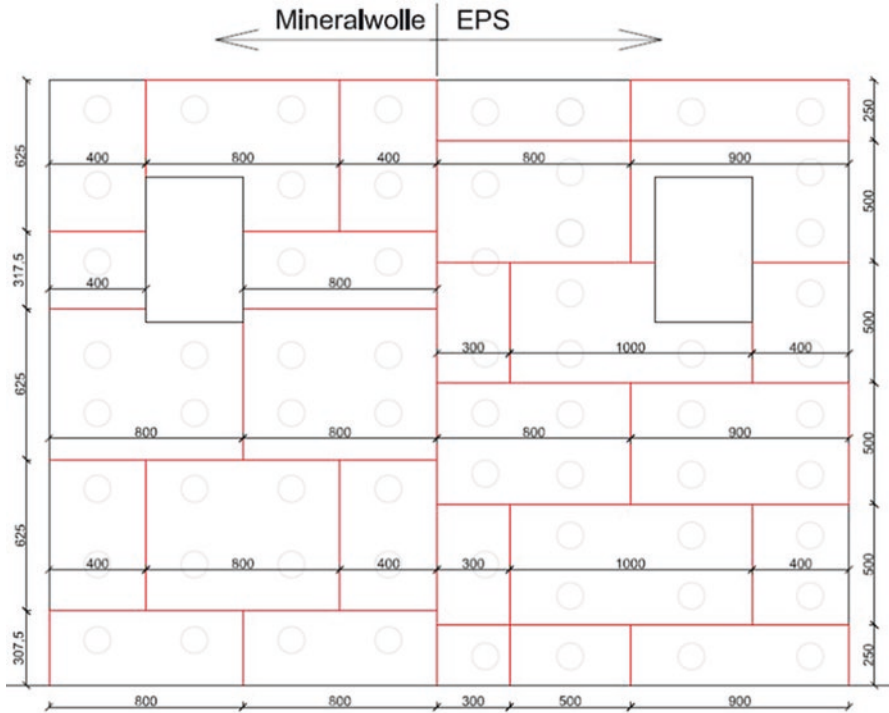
Drawing of façade construction for EOTA test application: left mineral wool and right extruded polystyrene insulation (EPS) [3]
